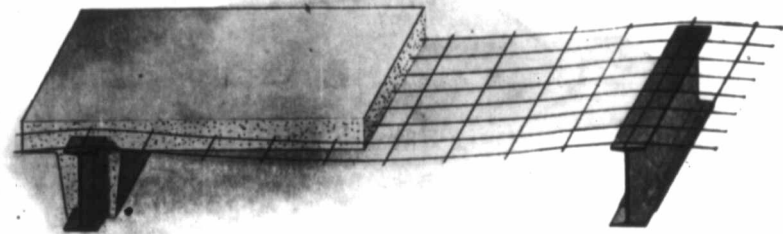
is the same as No. 1, excepting that the reinforcing is placed near the top of floor over the I beams and deflected to near the bottom of the floor slab in the centre, between the bearings.
